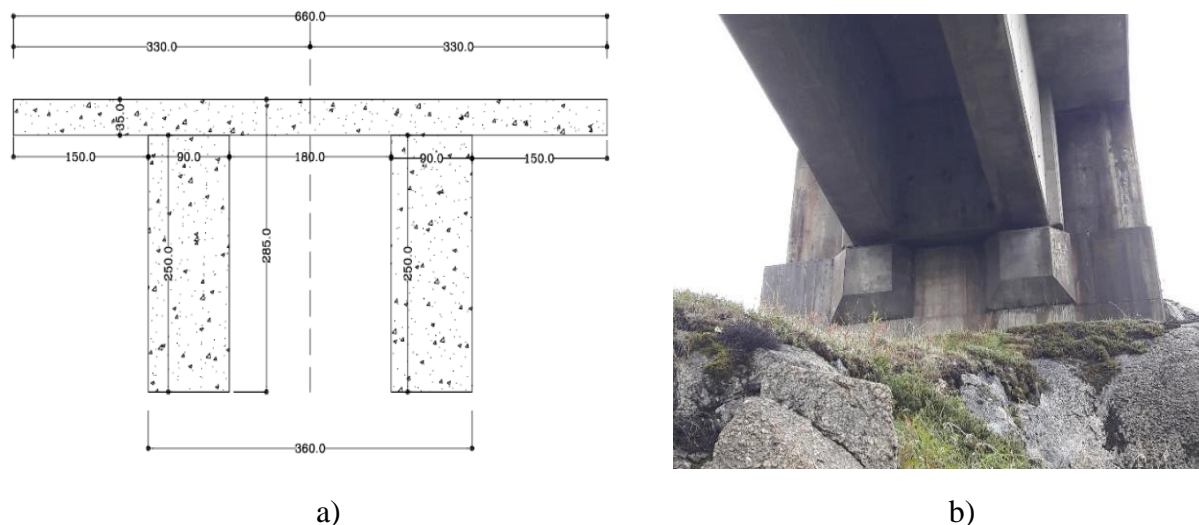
Bridge B1; a) The cross section (unit:cm), b) bridge support.
